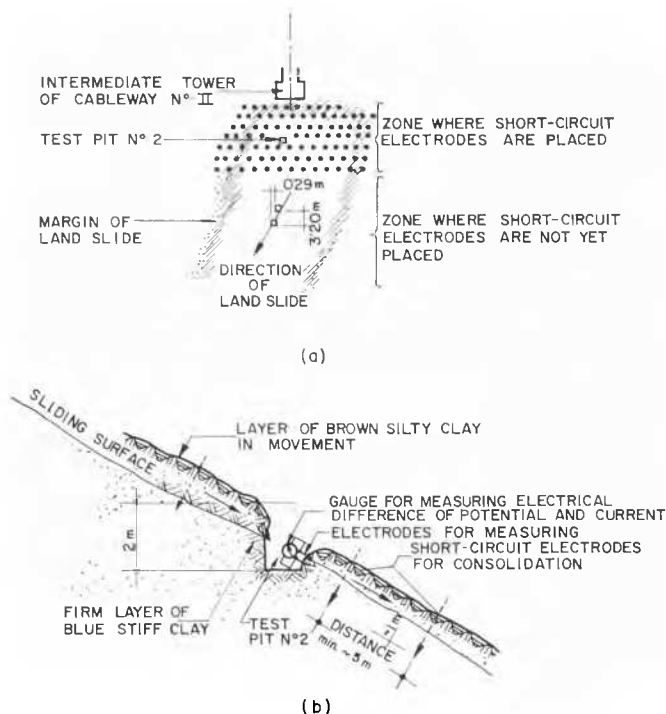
Landslide stabilization. (a) plan; (b) section through test pit.
